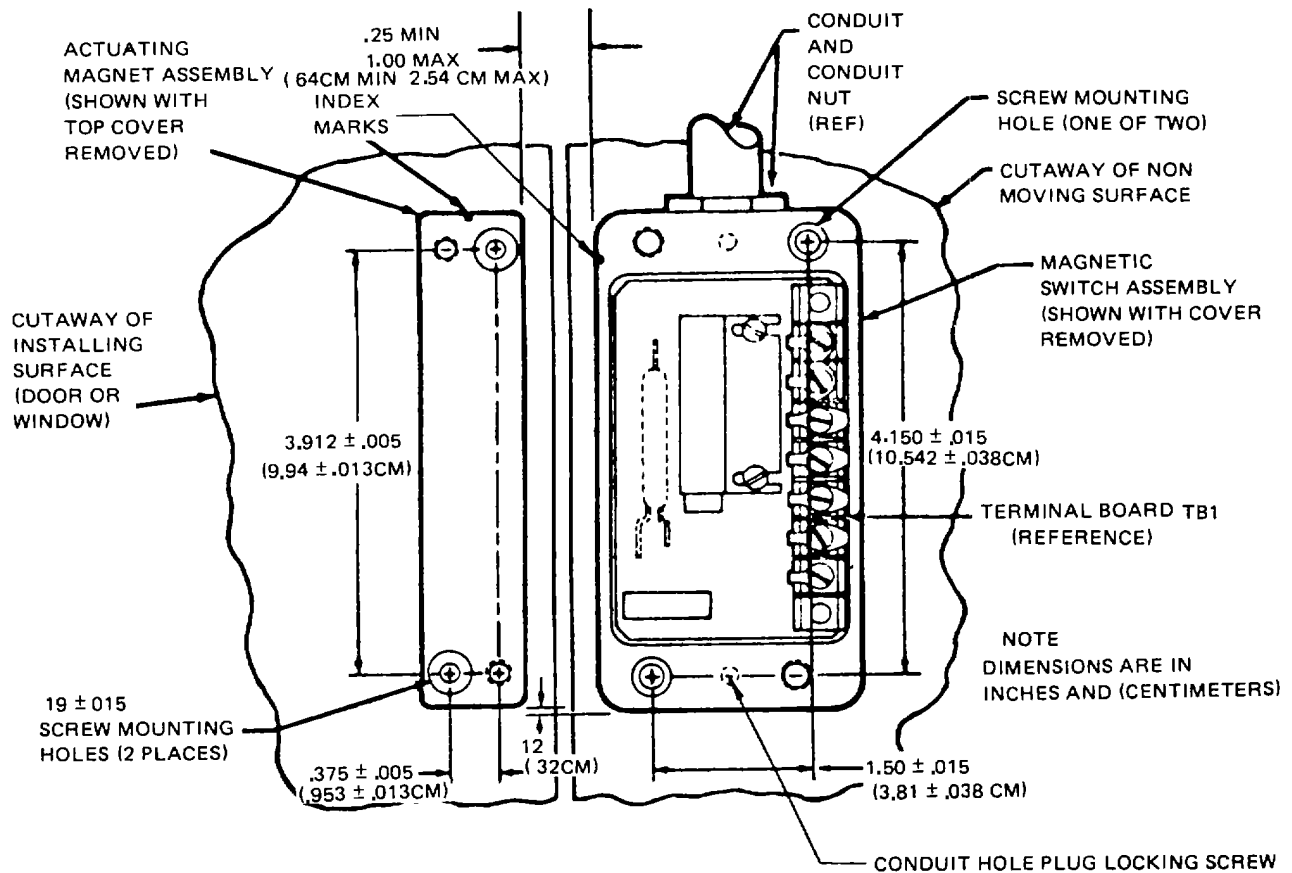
Mounting Dimensions typical Balanced Magnetic Switch Installation
